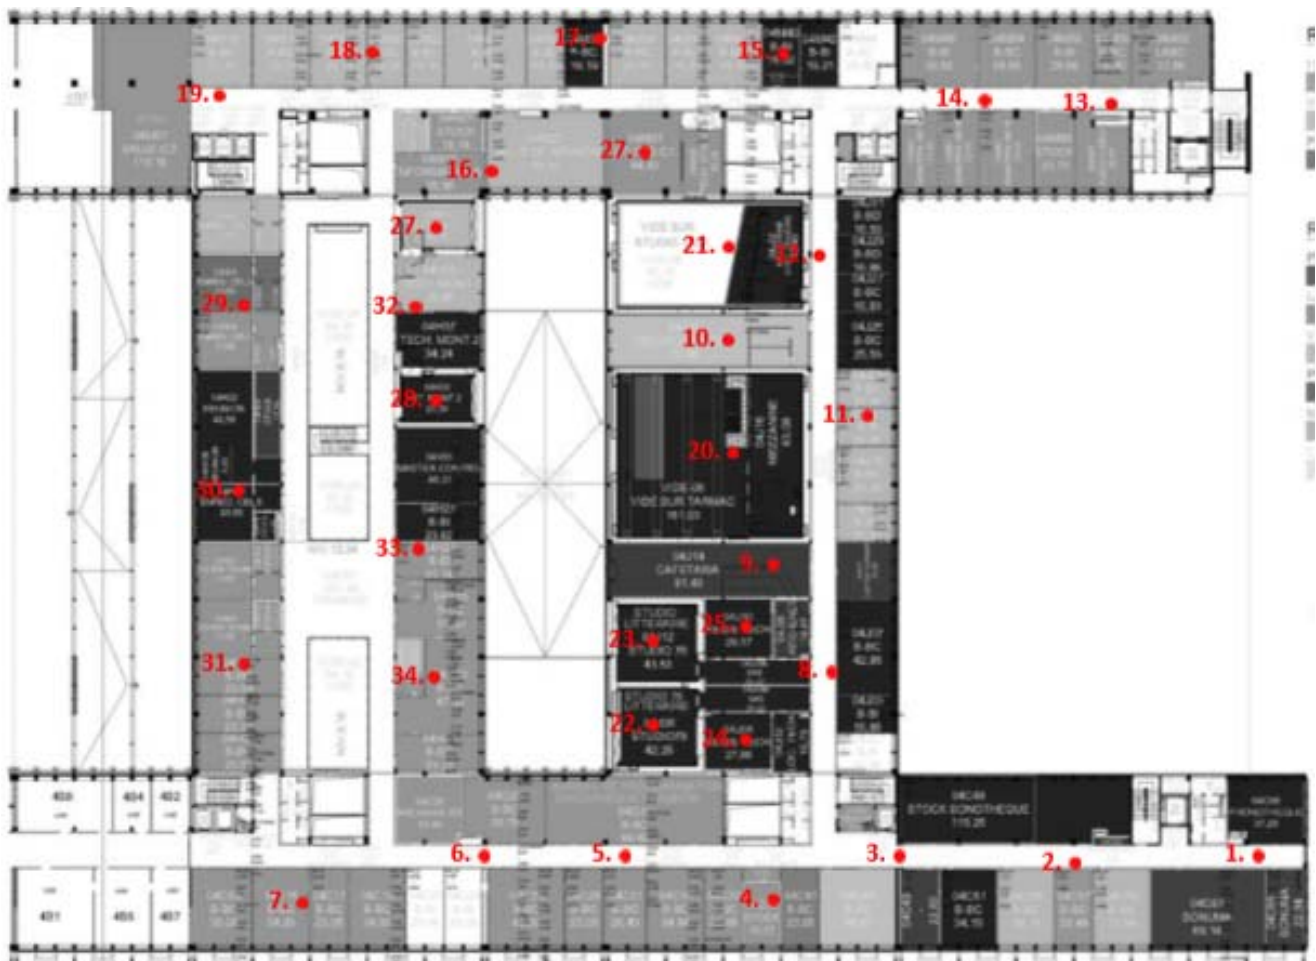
Placement Access Points for Floor 4 in Building PUVQ
